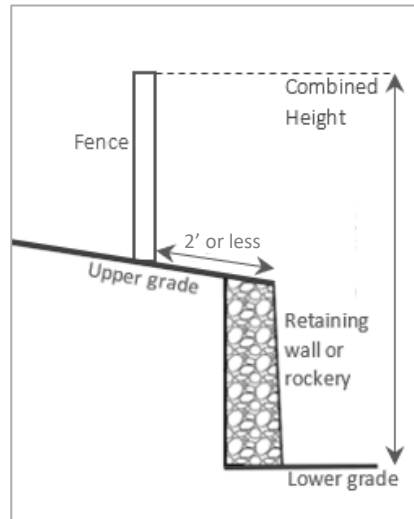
If a fence is set back from the edge of the retaining wall by 2 feet or less the wall and fence height measurement is combined, for a maximum allowed height of 8 feet.
